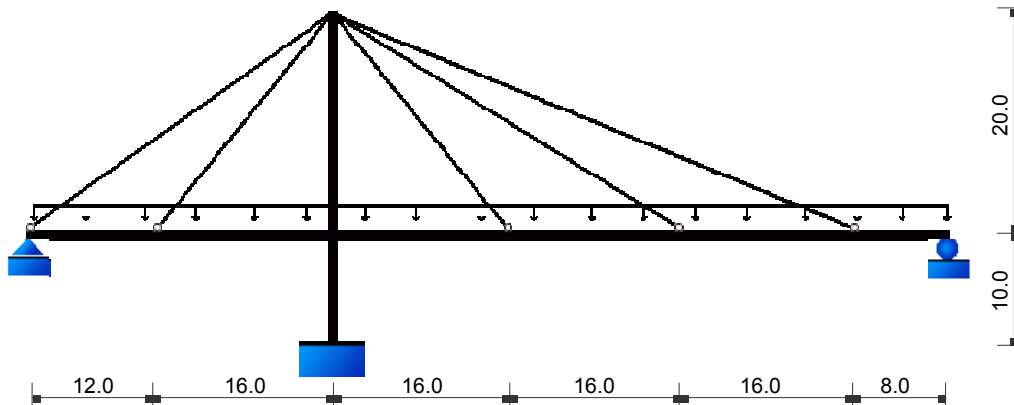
Configuration at the final stage of an asymmetrical cable-stayed bridge
